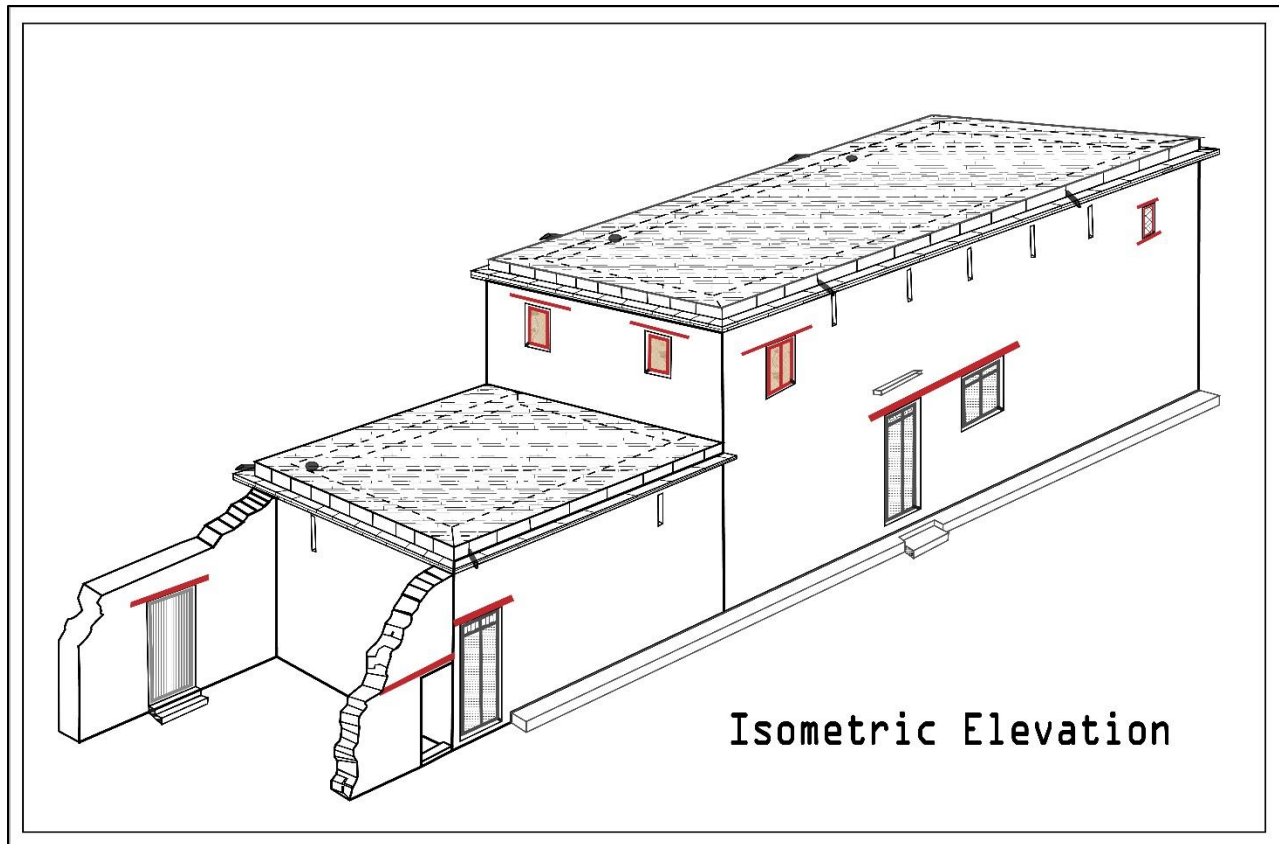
Isometric View of Ato Assefa Tedla Hidmo House. Made Using Adobe Illustrator, 2020.
